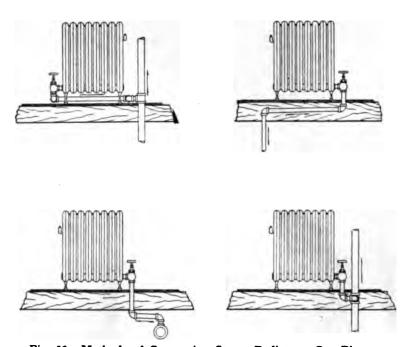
Methods of Connecting Steam Radiators, One-Pipe.
